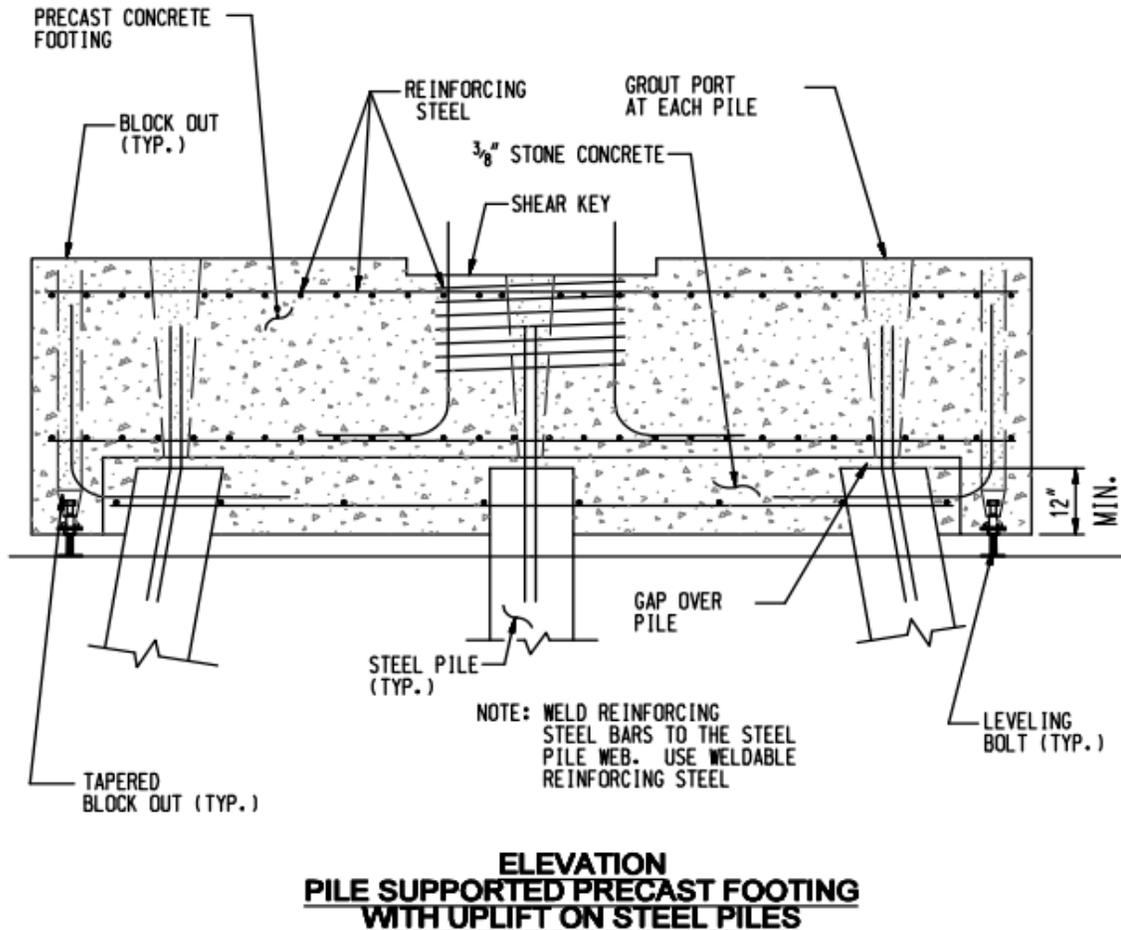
Connection between precast concrete footing and steel pile with uplift
